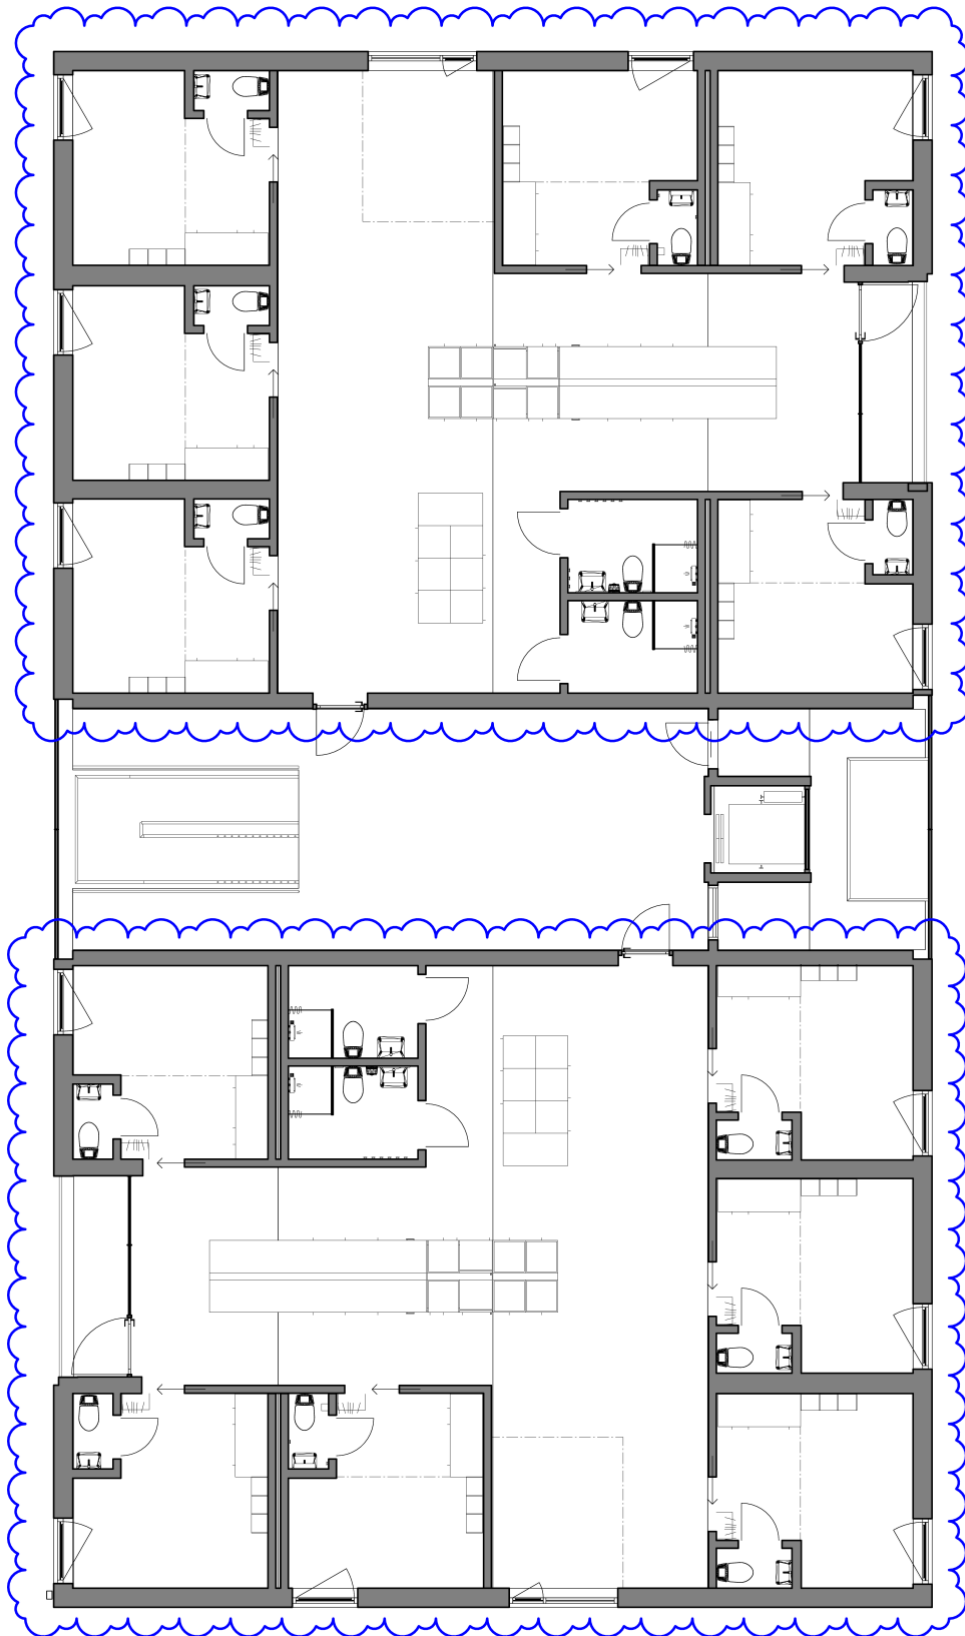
Existing Layout of Typical Floor HSB Living Lab
